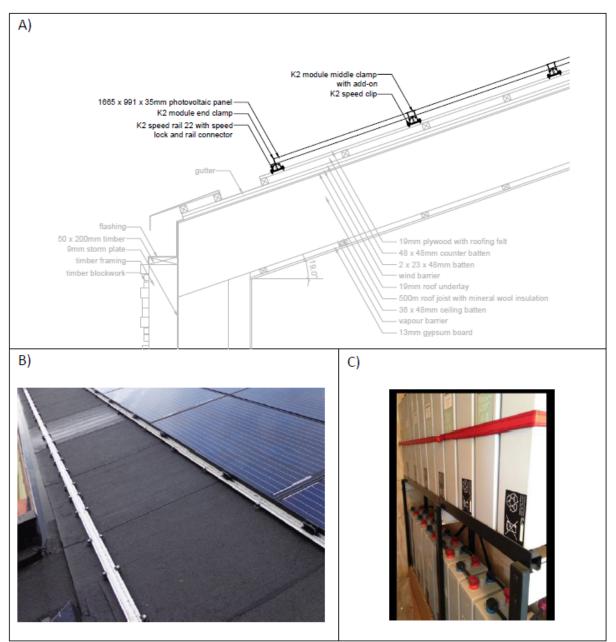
A) Section of the roof construction, B) Picture of the roof installation, C) Battery bank (Kristjansdottir, Good et al. 2016)
